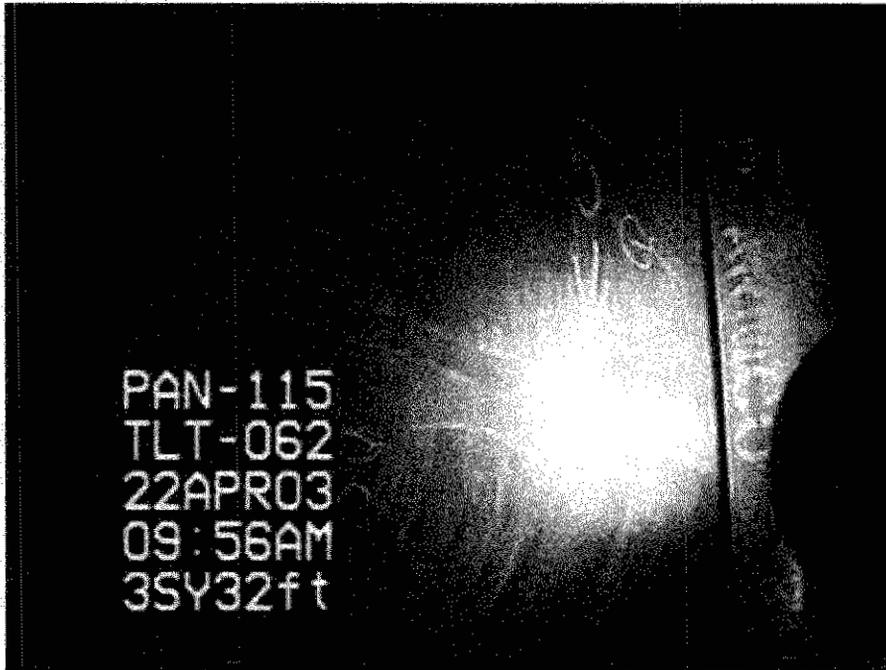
SY-103 Riser 40, Primary Tank, Knuckle Weld (2003)
